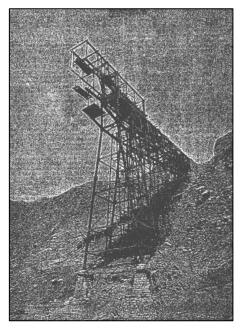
View showing newly built west pier and use of traveler to build out cantilever span.
